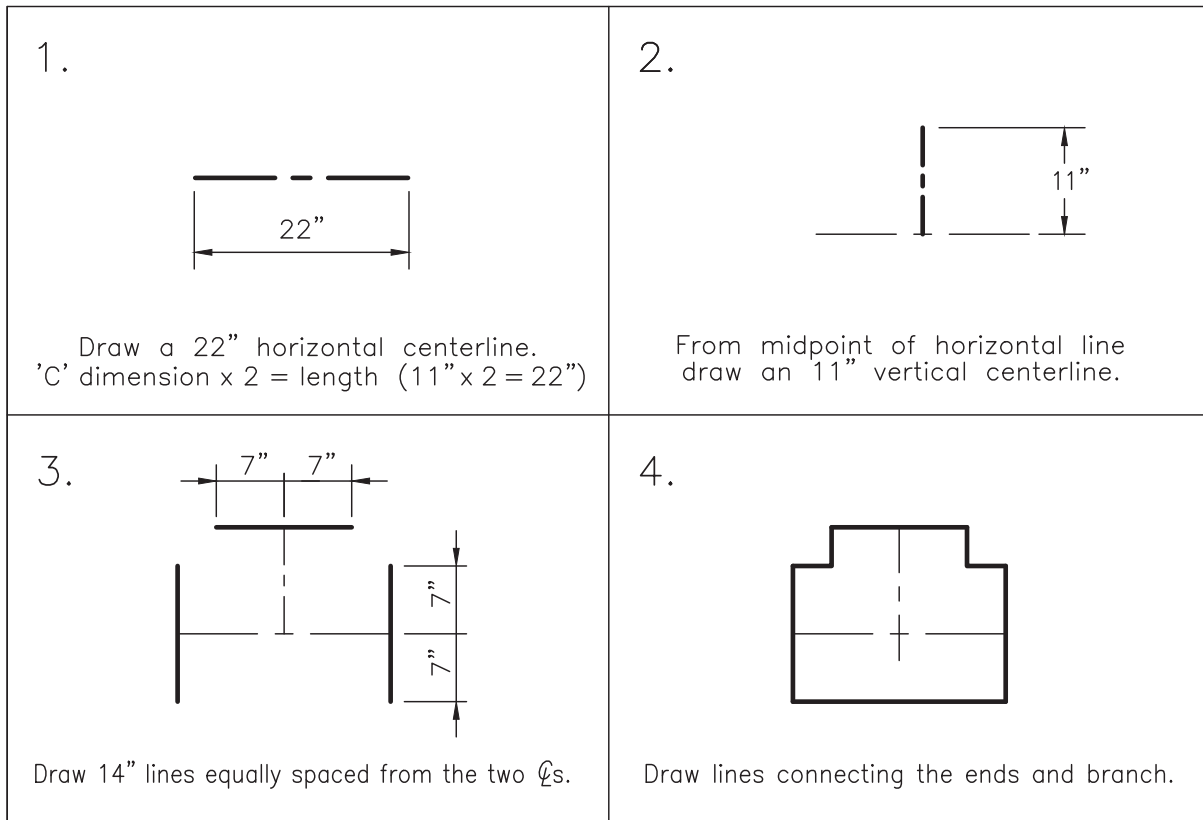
14" welded straight tee drawing symbols.
